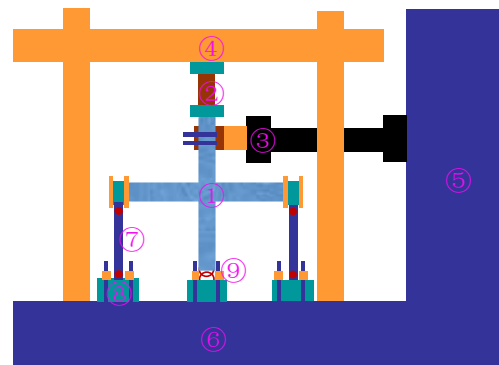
Schematic diagram of test setup: ① joint specimen, ② vertical hydraulic jack, ③ hydraulic actuator, ④ crossbeam, ⑤ reaction wall, ⑥ lab ground, ⑦ tie rod, ⑧ bottom compression beam, ⑨ ball hinge
